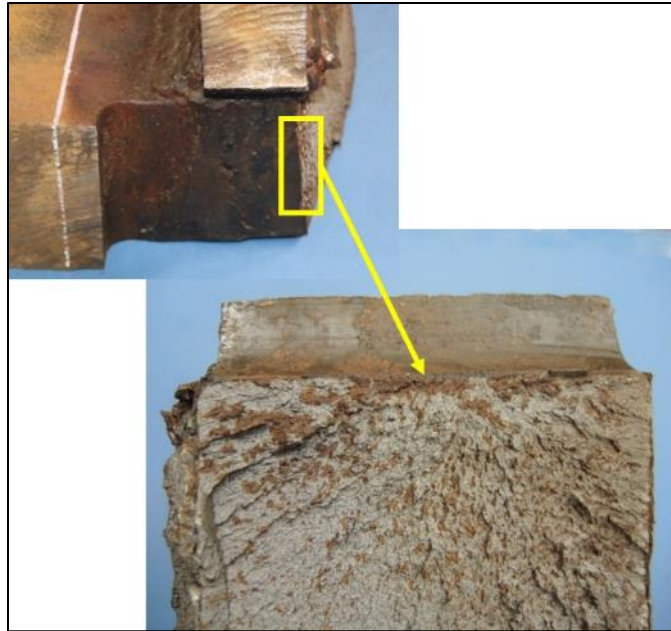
Dark oxide covered narrow band microcrack fracture origin at the weld access hole (top) of girder sample D.4-SW.
